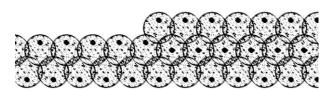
Layout of the jet-grouting columns in plan. The thickness of the wall is created by a double or triple row of intersecting columns.
